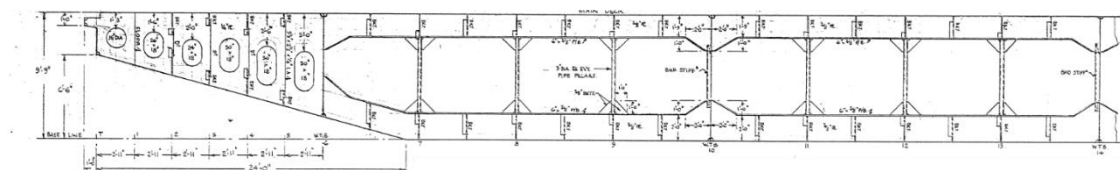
Crossing Sectional View Illustrating Longitudinal Support Structure
